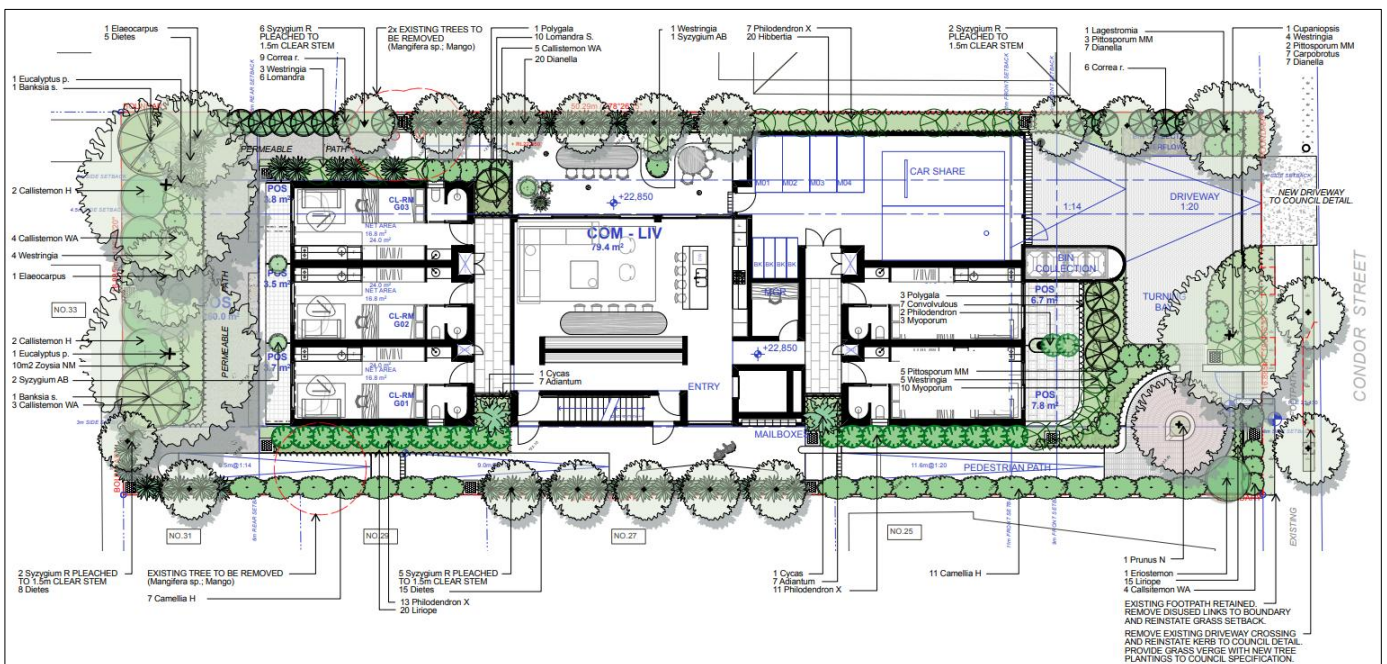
(above) Ground Floor Landscape Plan submitted by the applicant. Source: Matthew Higginson (2025).
